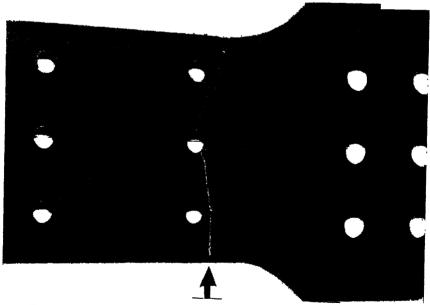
Typical Failure of the Four Special Joints Fabricated with Bolts.
